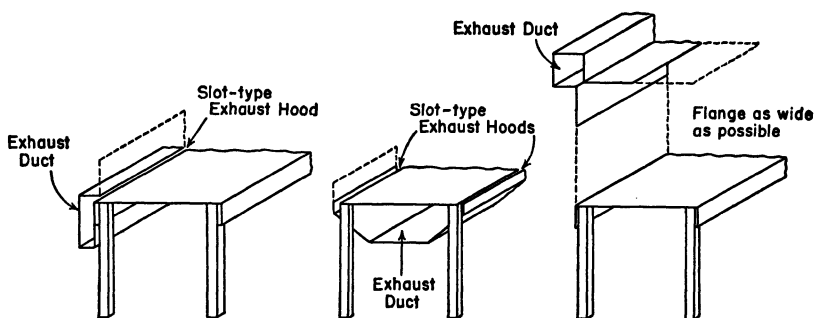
Lateral Exhaust Hoods at Work Benches
